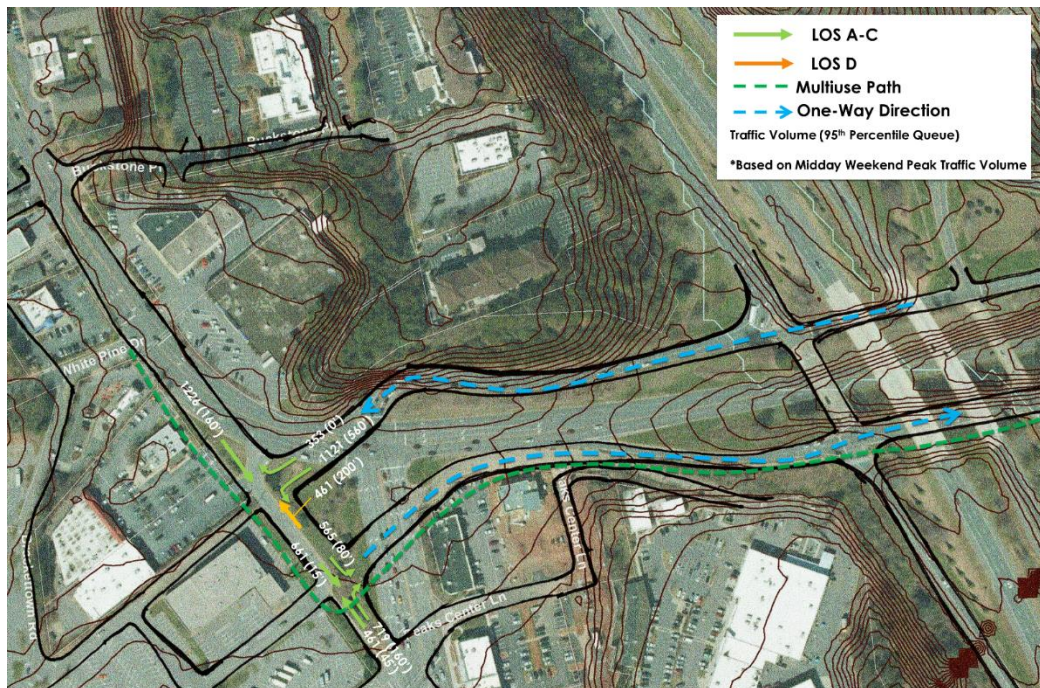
Tunnel Road/South Tunnel Road Quadrant Plan & Weekend Midday Peak Traffic Operations Summary
